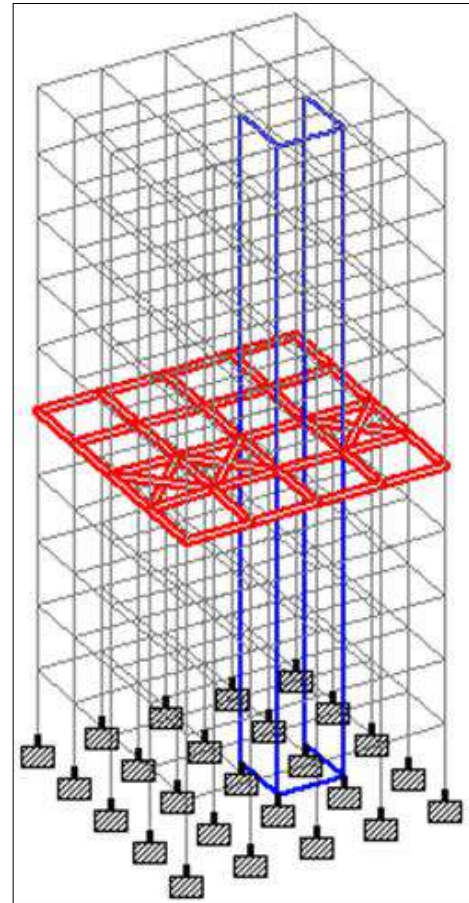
Model-V: Outrigger (bracings) at middle (fourth) floor with core wall (EQ-5)
